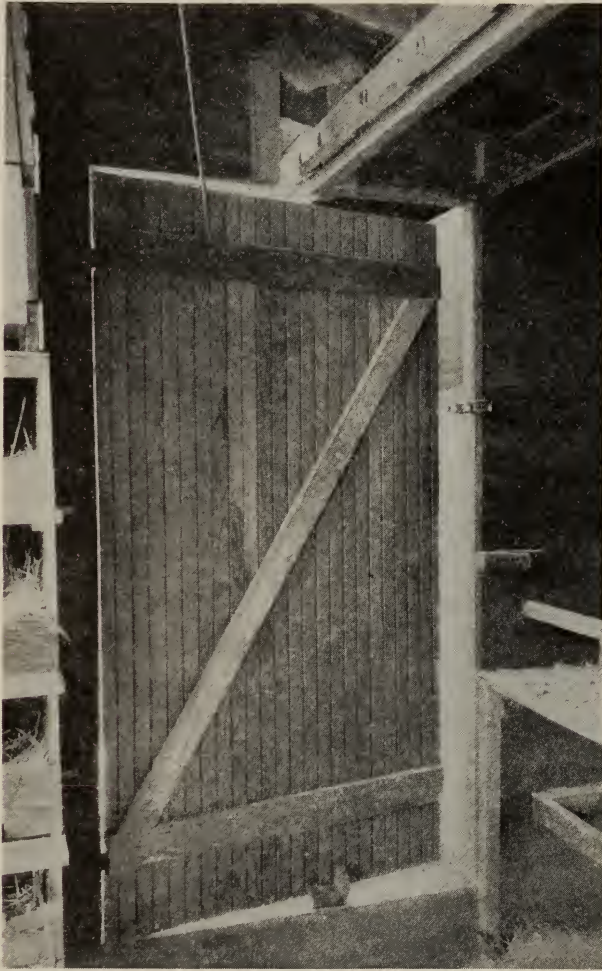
A practical, inexpensive way to hang a double-swing, inside door in a poultry house. The door shown, however, is made of too heavy material for the purpose. Note hinges, door catches and springs.
